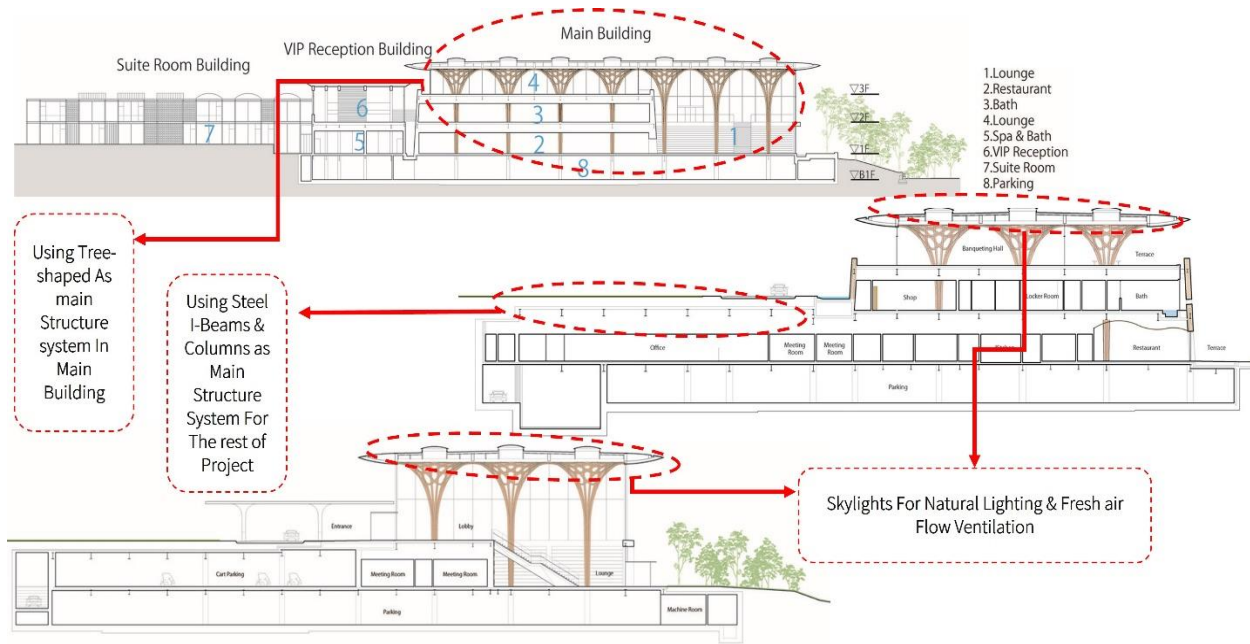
Tree-like pillars converge to form an octagonal, interwoven roof support. Source: "Shigeru Ban architects."
